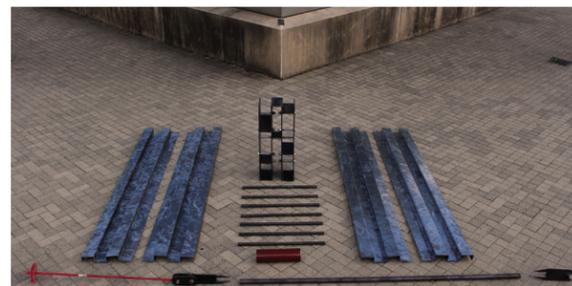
| All of the bike shelter prototype's steel members. After fabrication, the wood and metal parts were assembled together on site.
